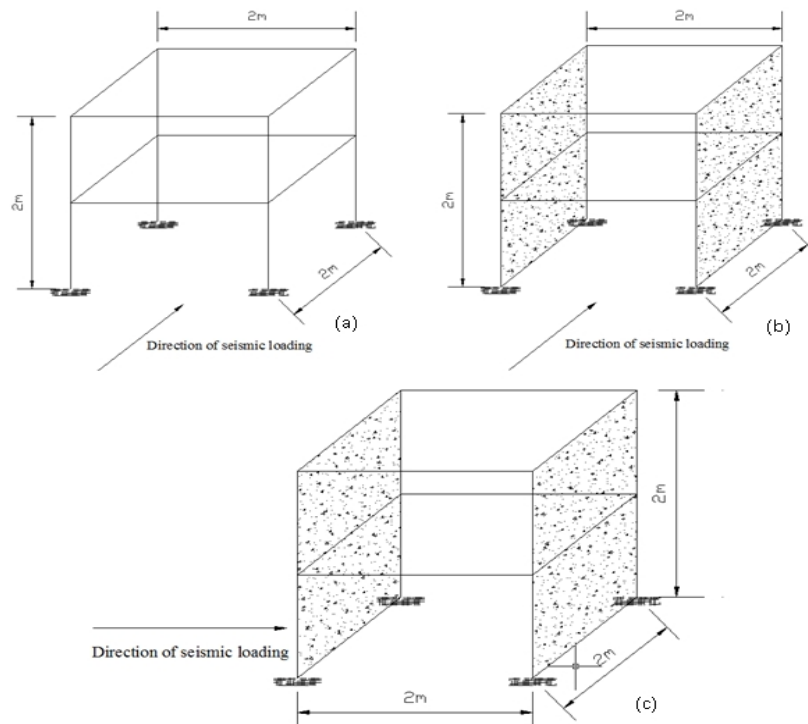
(a) Frame Structure, FS (b) Wall Structure 1, WS-1 and (c) Wall Structure 2, WS-2
